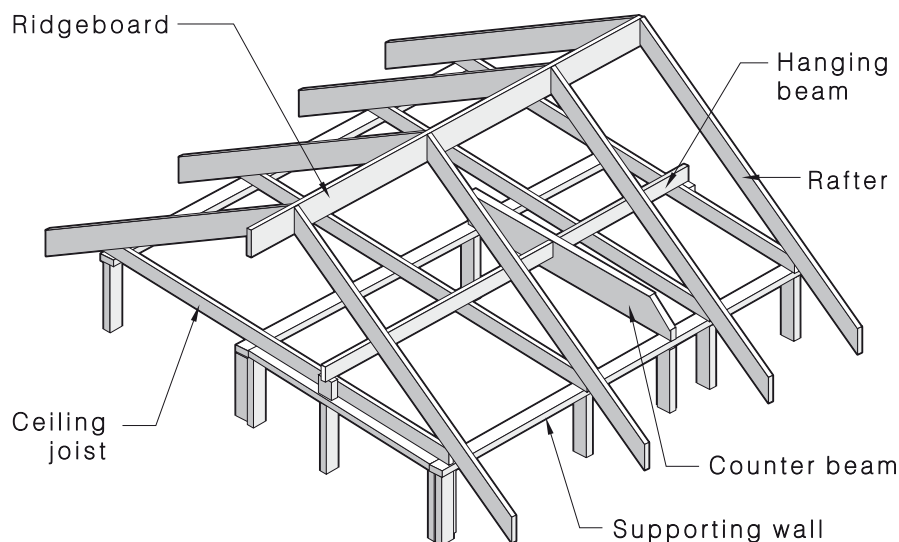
COUNTER BEAM SUPPORTING HANGING BEAMS
